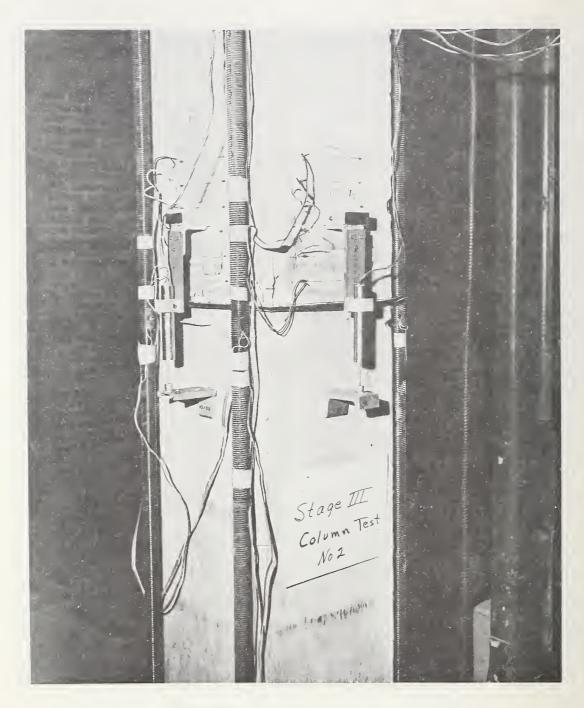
Instrumentation of Test Specimen With Grouted Dowel
